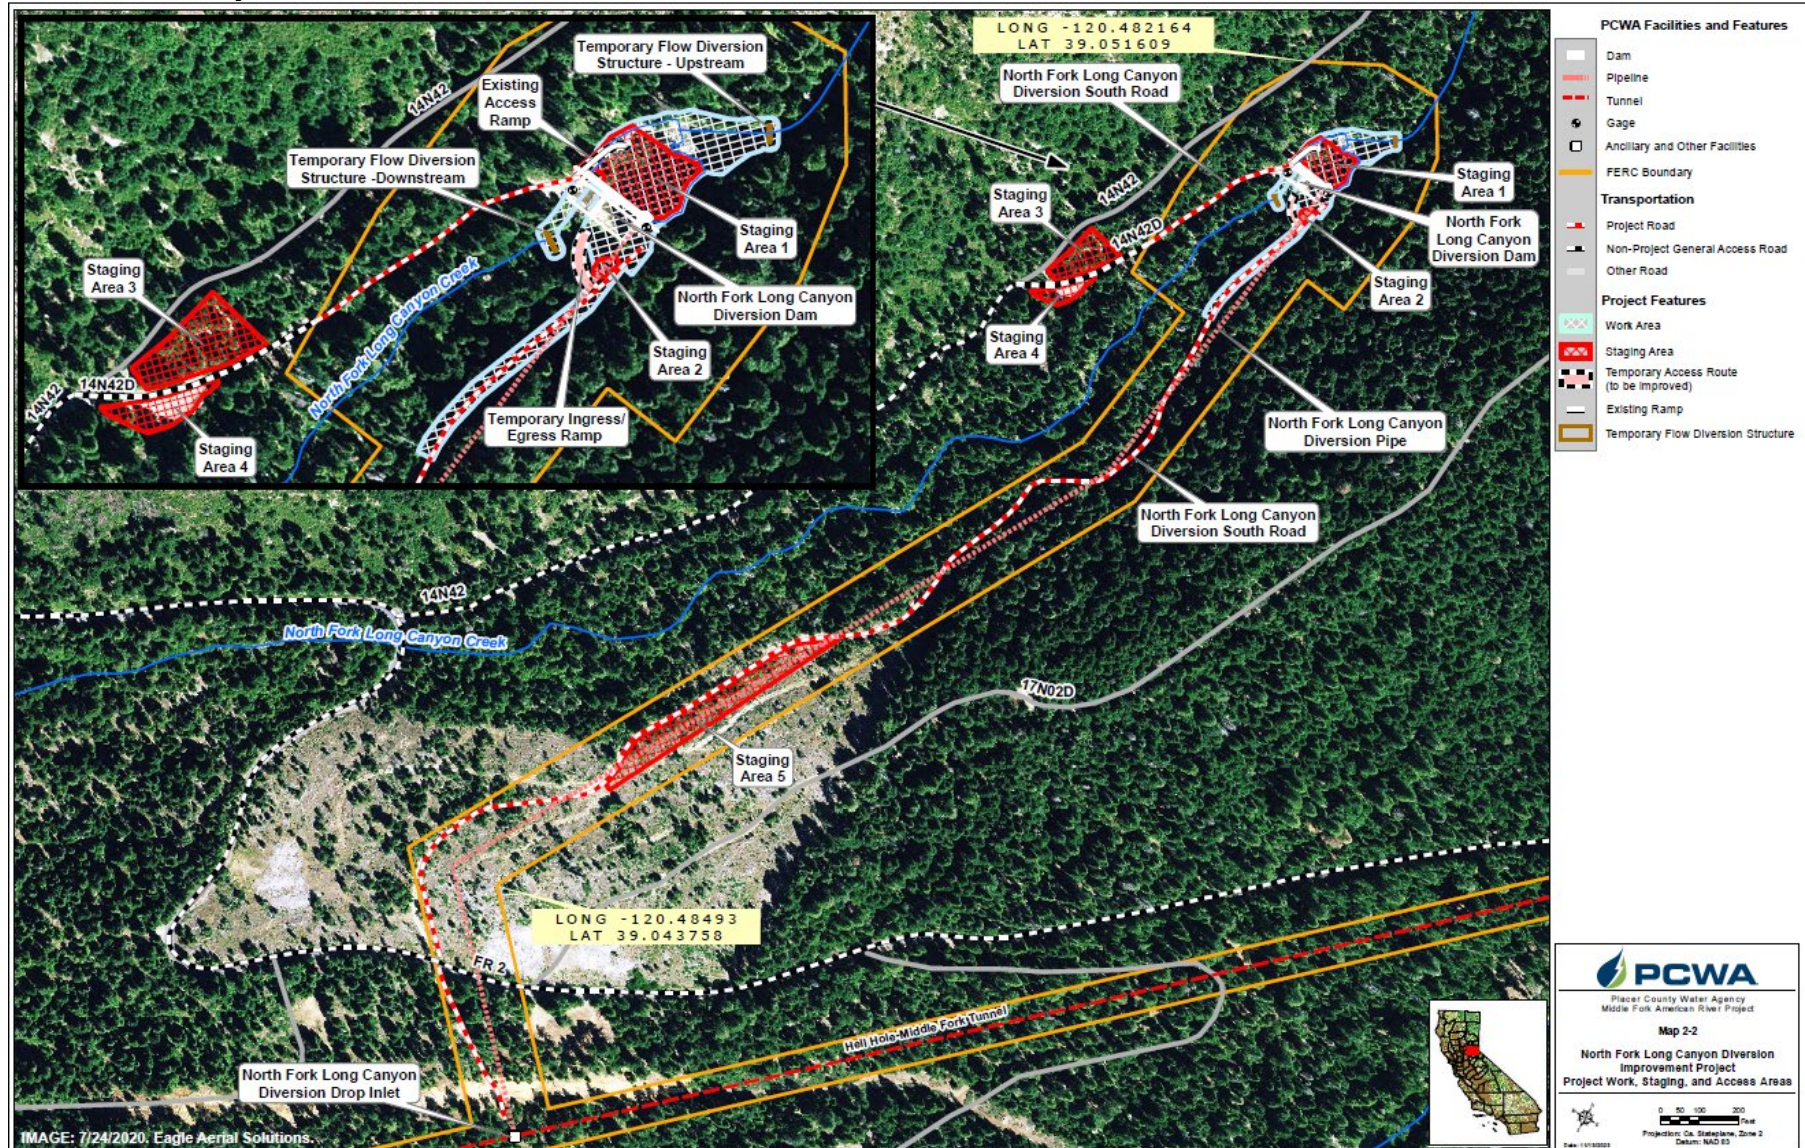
Aerial View of North Fork Long Canyon Diversion Improvement Project Staging Areas (PCWA 2023)
